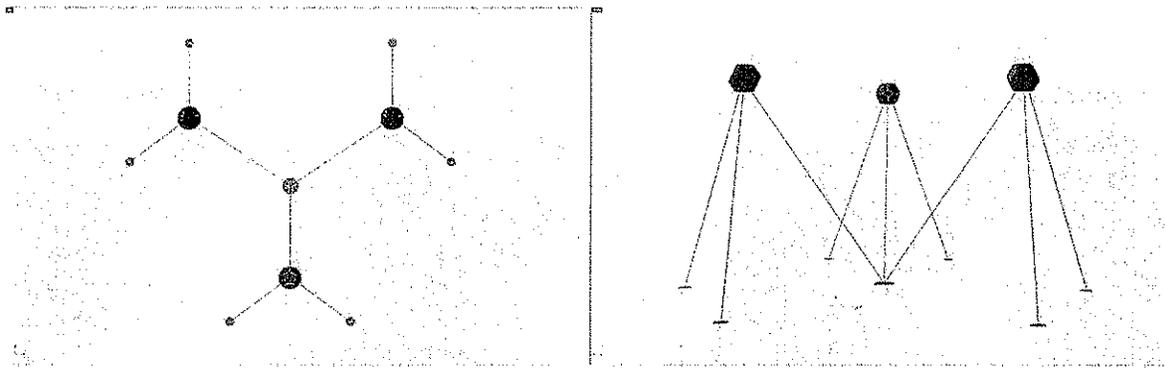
Plan view (left) and 3D side view (right) of pavilion/mooring configuration.
